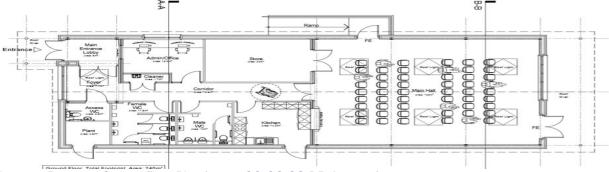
Proposed Ground Floor Plan (24101-CO-CC-DR-A-21001)
